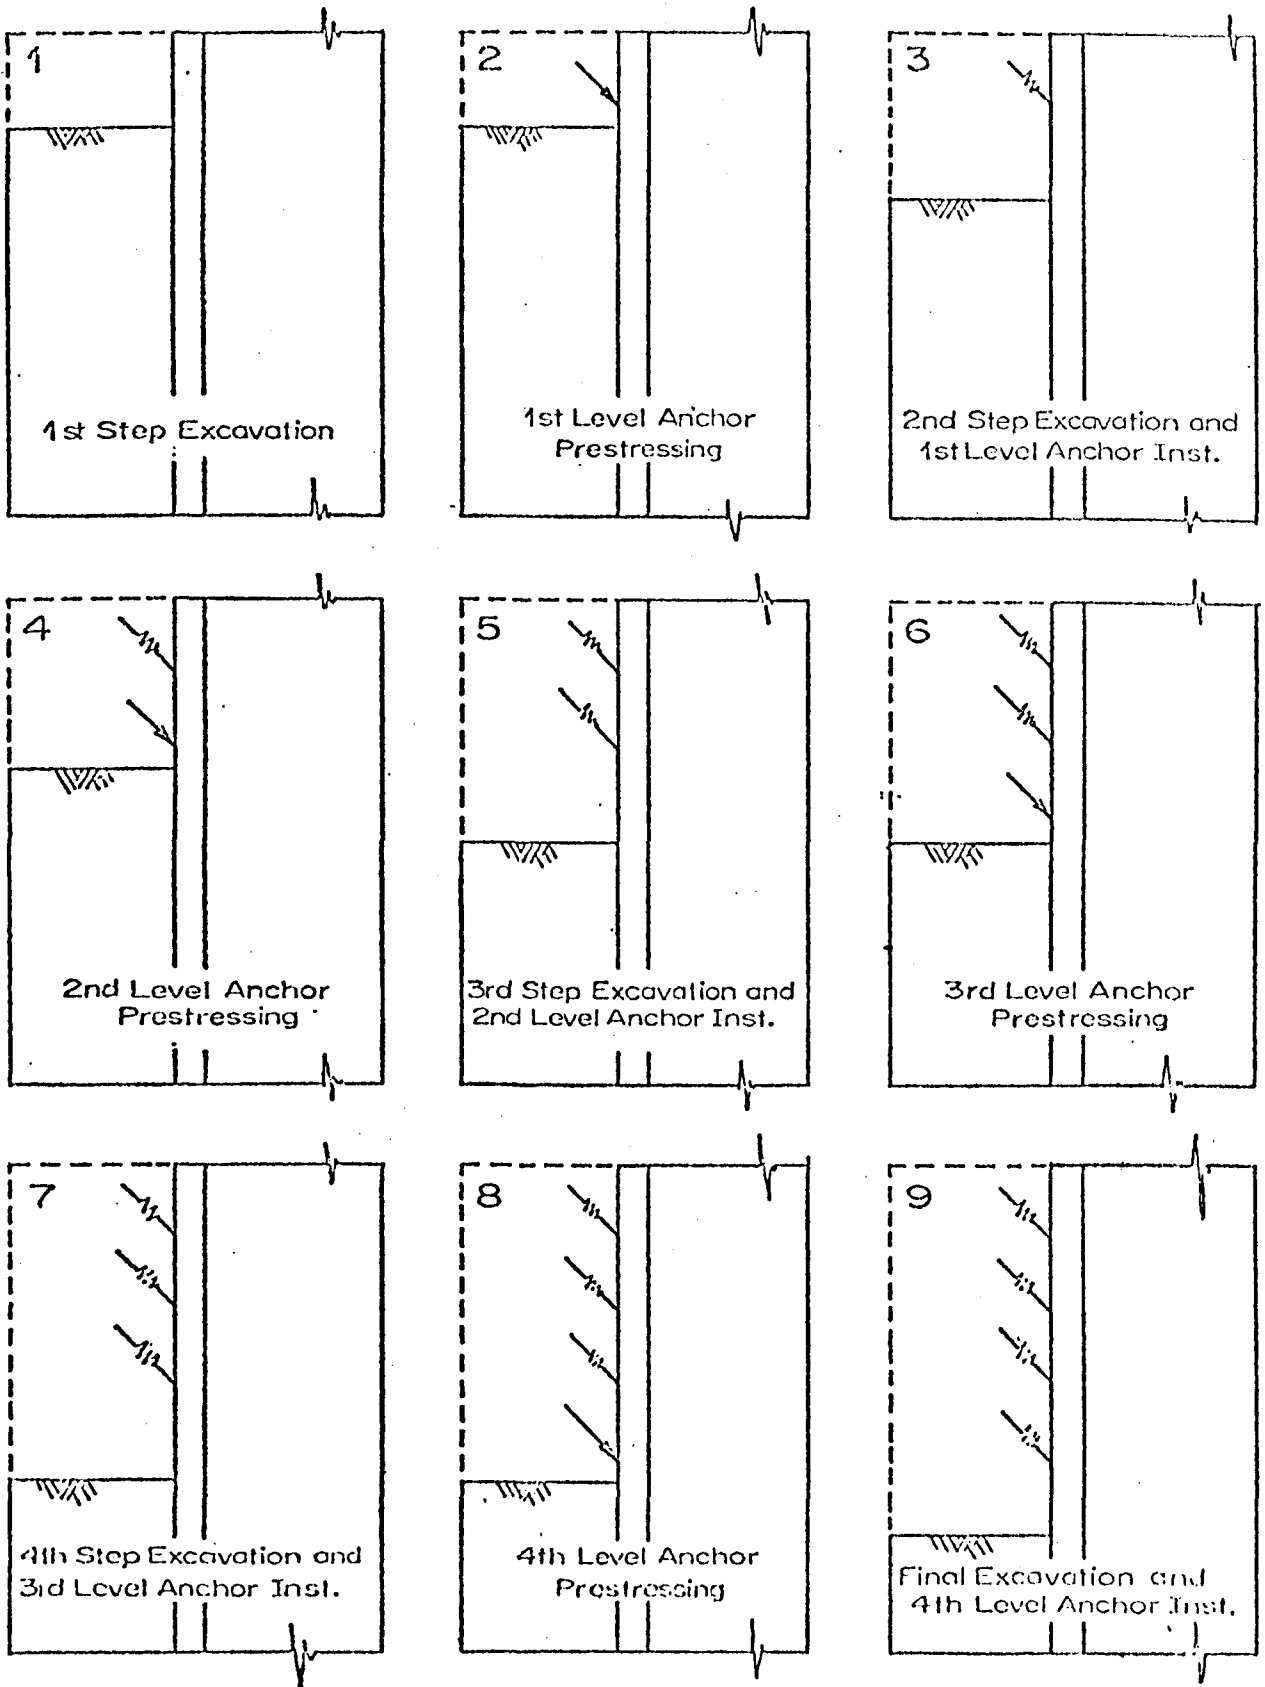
CONSTRUCTION SEQUENCES FOR TIED-BACK EXCAVATION (After Clough and Tsui, 1974)
